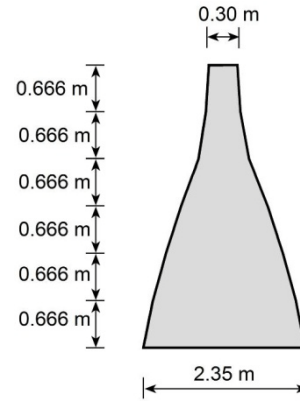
Optimized cross section of the gravity retaining wall of 4 m height.
